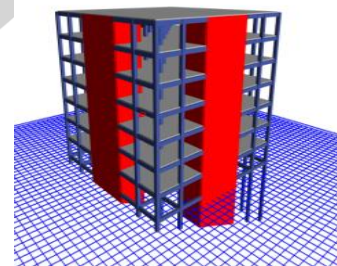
Building with Channel-shape shear walls on plain and sloping ground
